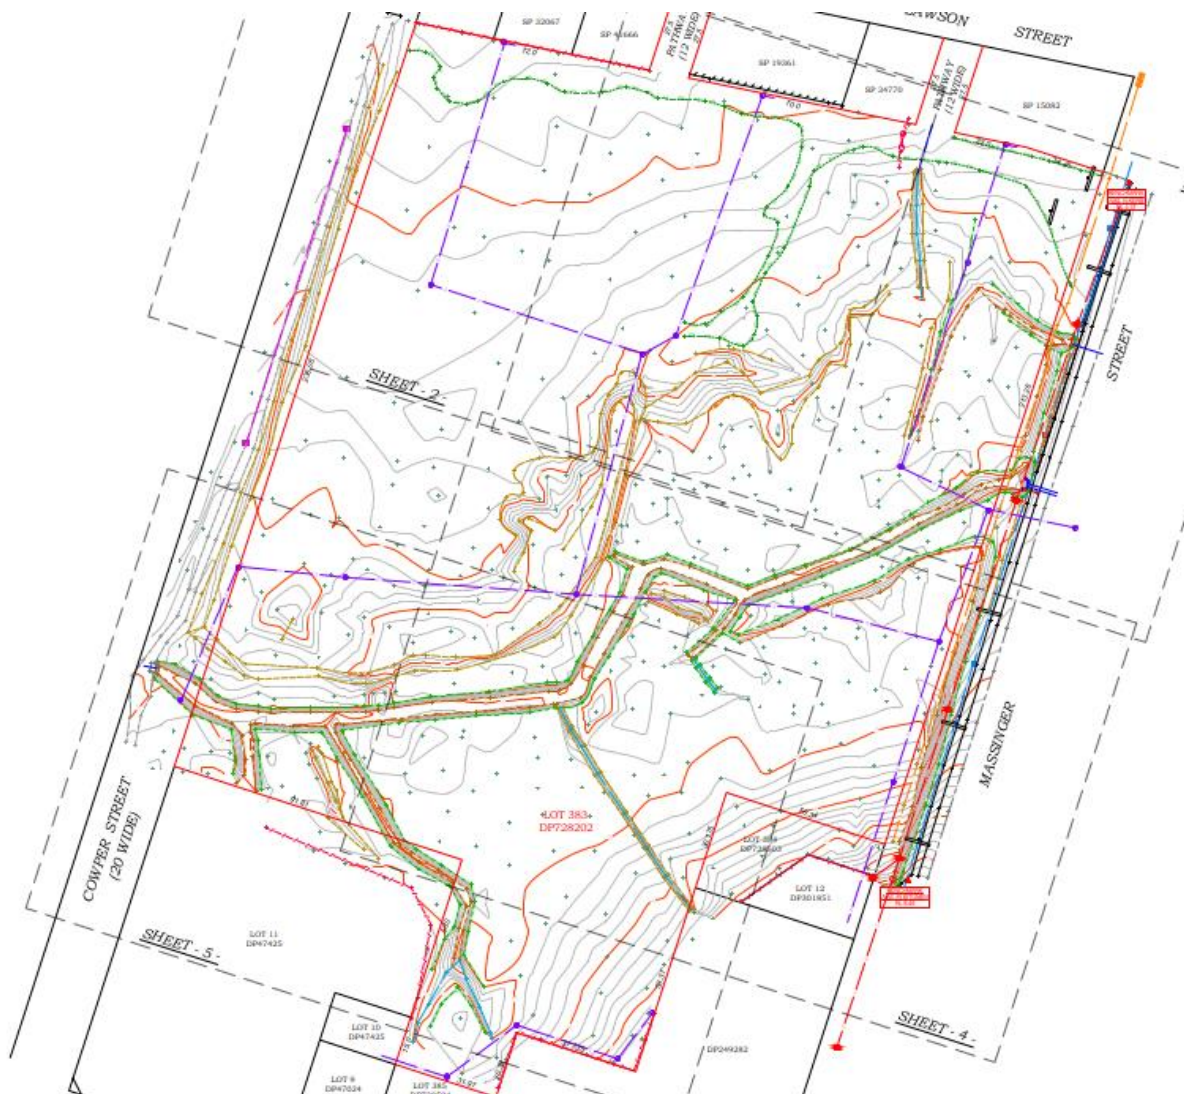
| Existing Surface Drainage Features (Source: Byron Bay Surveying, Aug 2021)
